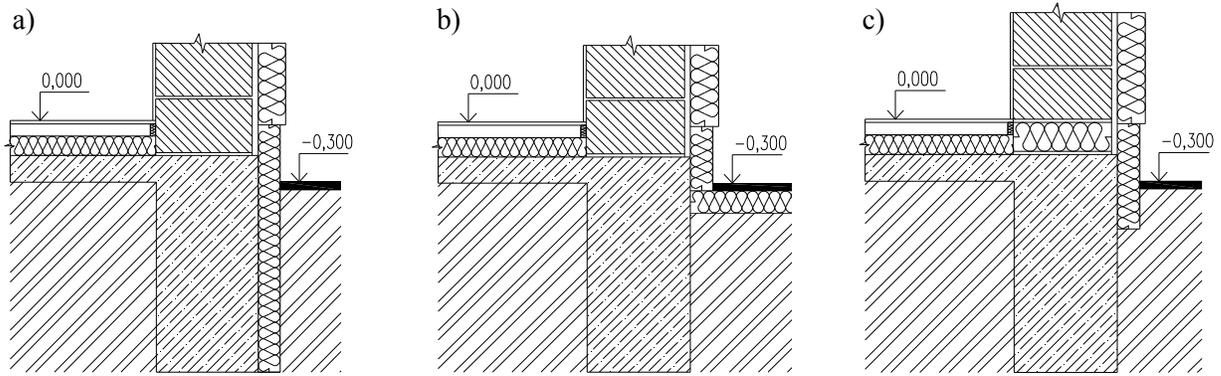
Wall Footing Detail - Interruption of Thermal Bridge, Methods of Solution
